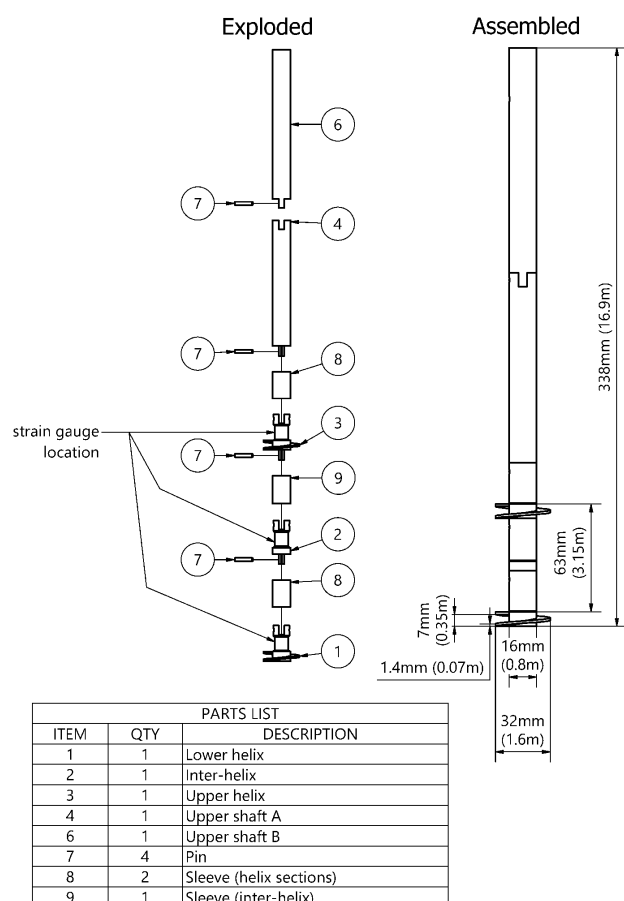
Schematic diagram of the instrumented screw pile assembly and components (Prototype dimensions shown in brackets).
